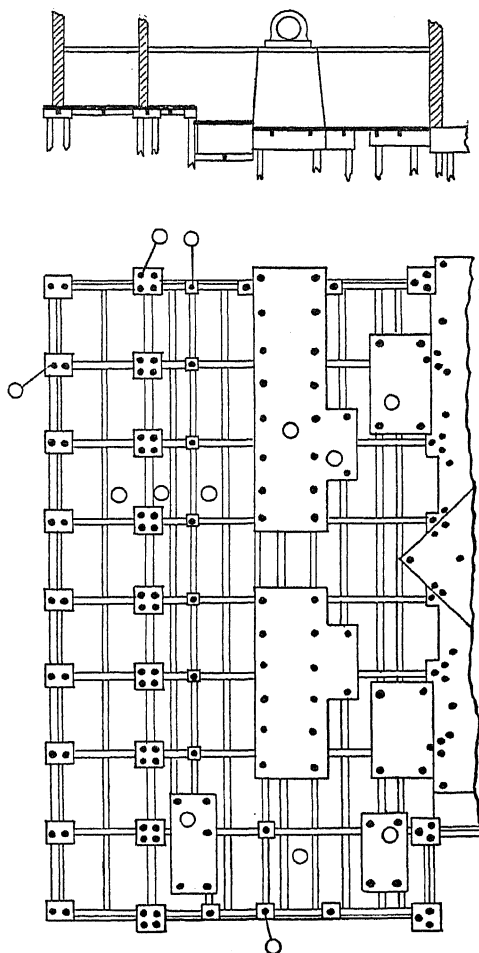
Foundations supported upon Concrete Raft and Piles.
